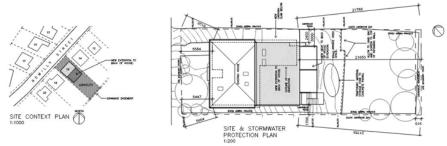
Applicant Location and Site Plans (Steven Spizick Architect, 2021)
